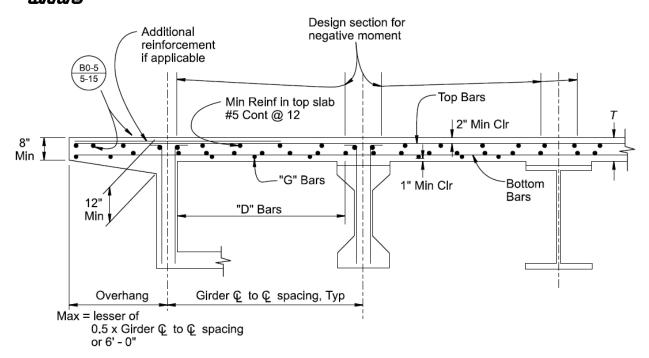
Typical Concrete Deck and Overhang Details
